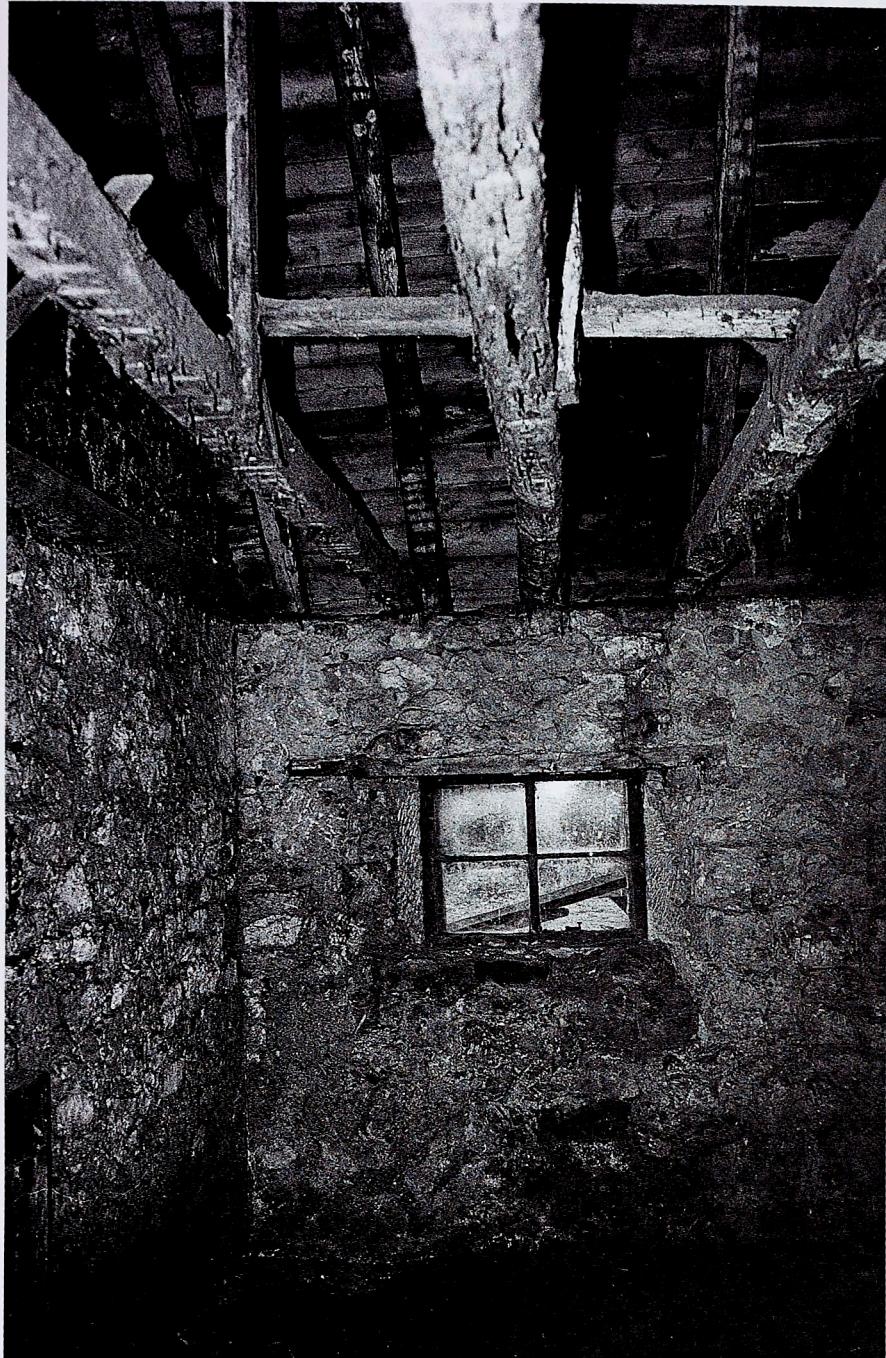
Interior of No. 11, showing the tree beams near the northeast corner of the north gable.
